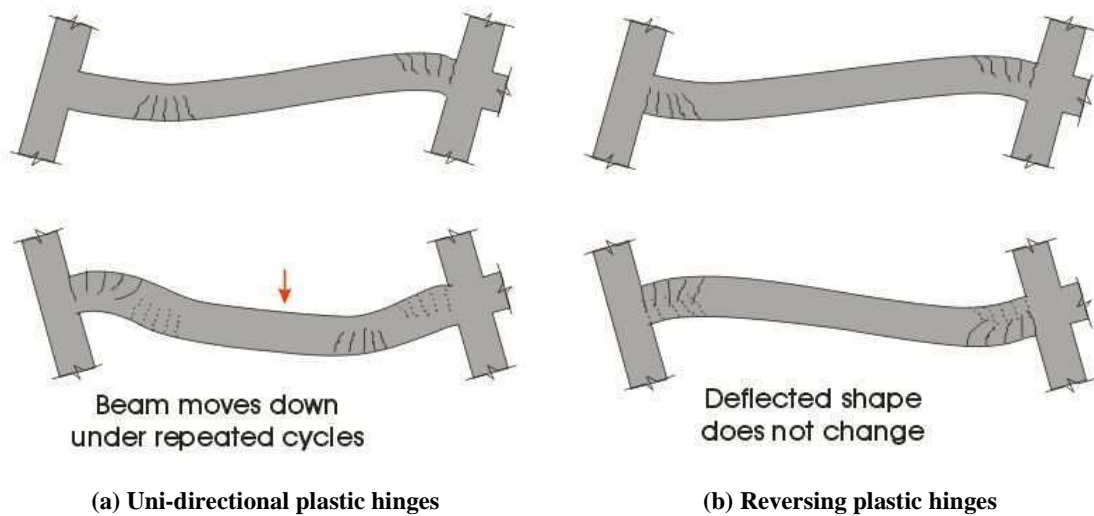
Types of plastic hinge in a ductile reinforced concrete beam (Adapted from Fenwick and Megget 1993)
